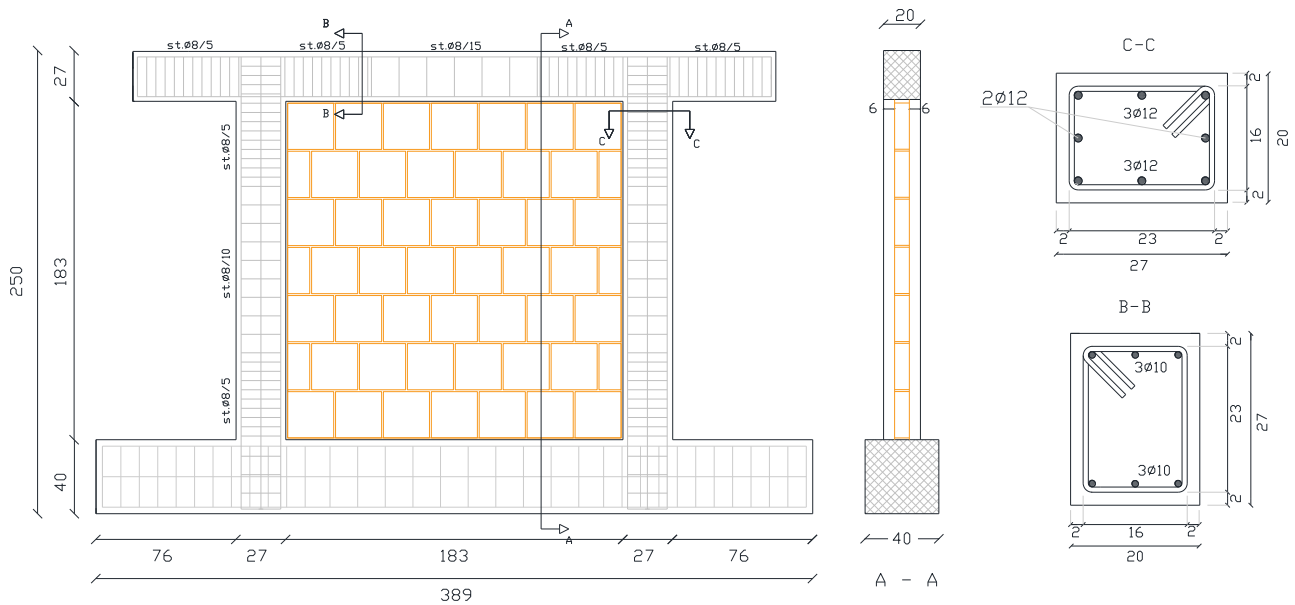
Geometrical and reinforcement details of the tested specimens (dimensions are in cm).
